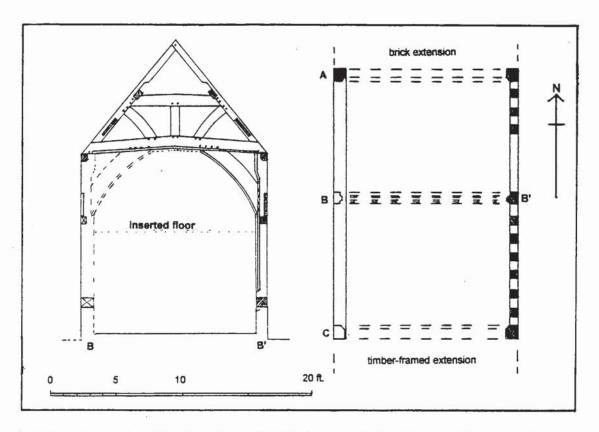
Plan and cross section of Place House Cottage, Titchfield. (The timber framing of the west wall has been largely replaced by brickwork. The cross frames at A and C are only fragmentary below tie-beam level.)
